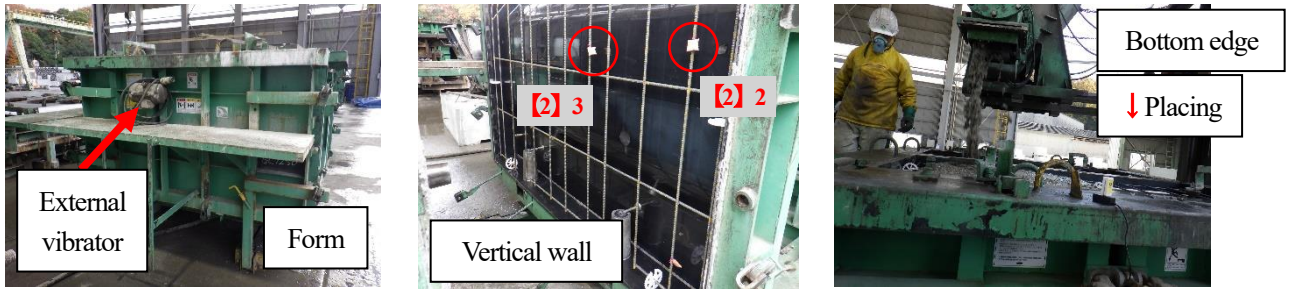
Form, installation of rfid tag and placing of concrete (L-shape retaining wall)
